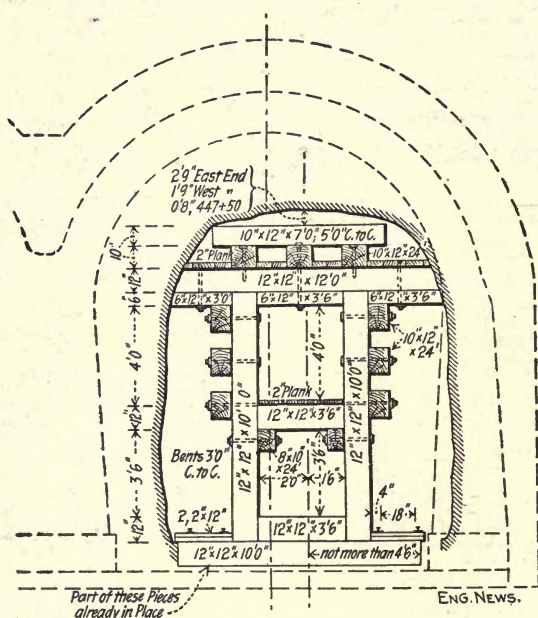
Timber-core Used in Rebuilding Old Tunnel.
